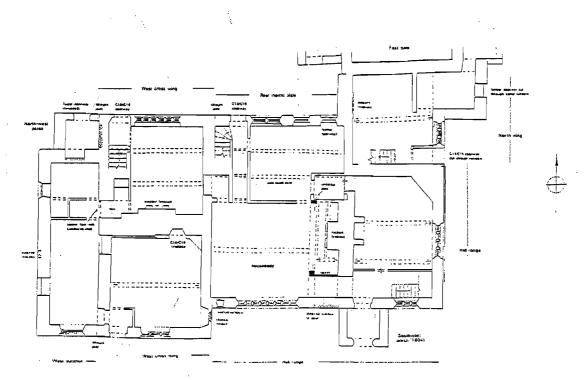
Ground-floor plan of the Upper Headley farmhouse showing the arrangement and nomenclature of the separate sections of the building (figure supplied by Ed Dennison Archaeological Services)
